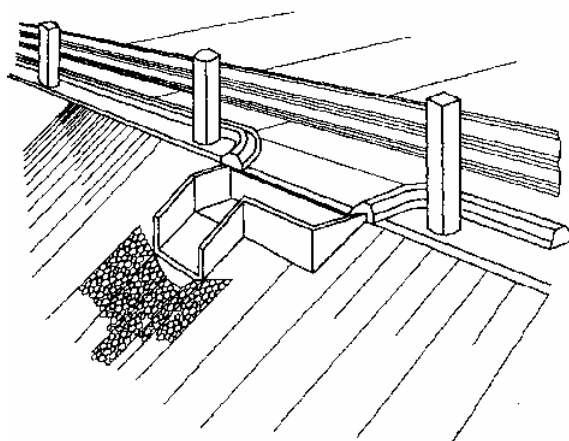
Opening of the Asphalt Curb (CB-A)
